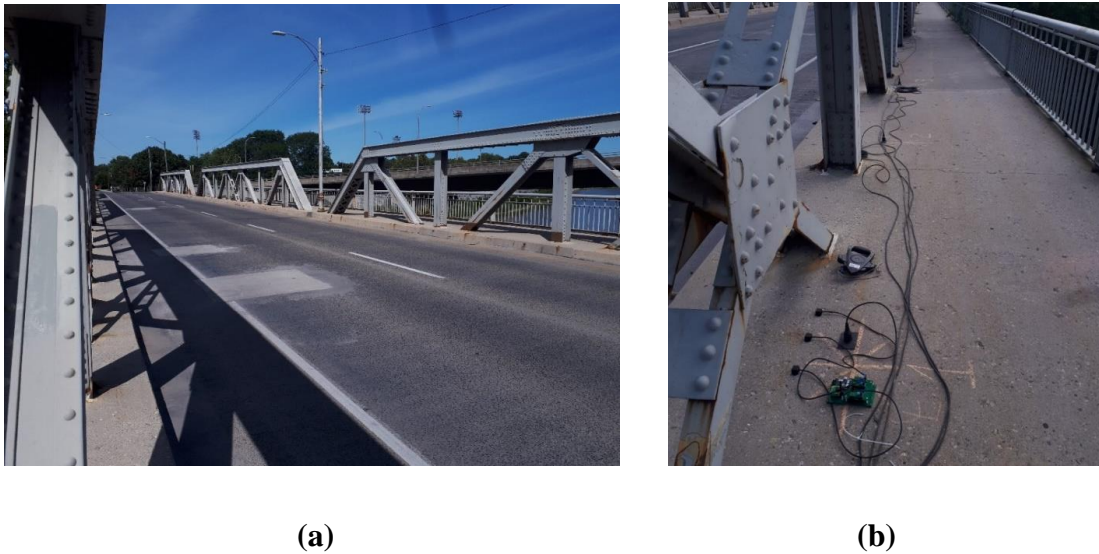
(a) Steel truss bridge, and (b) sensor instrumentation.
